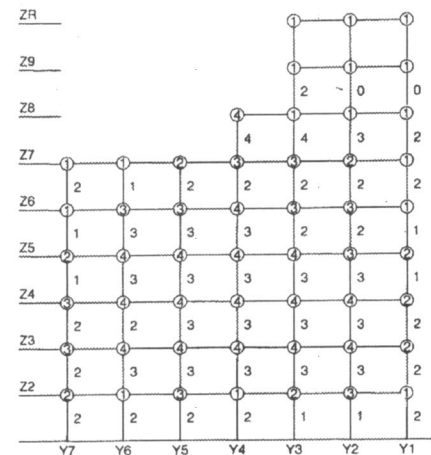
The failure distribution of each joint panel and column of a nine-story RC building in the North-South direction of the longitudinal frame (East side frame of Junes Rokko)
